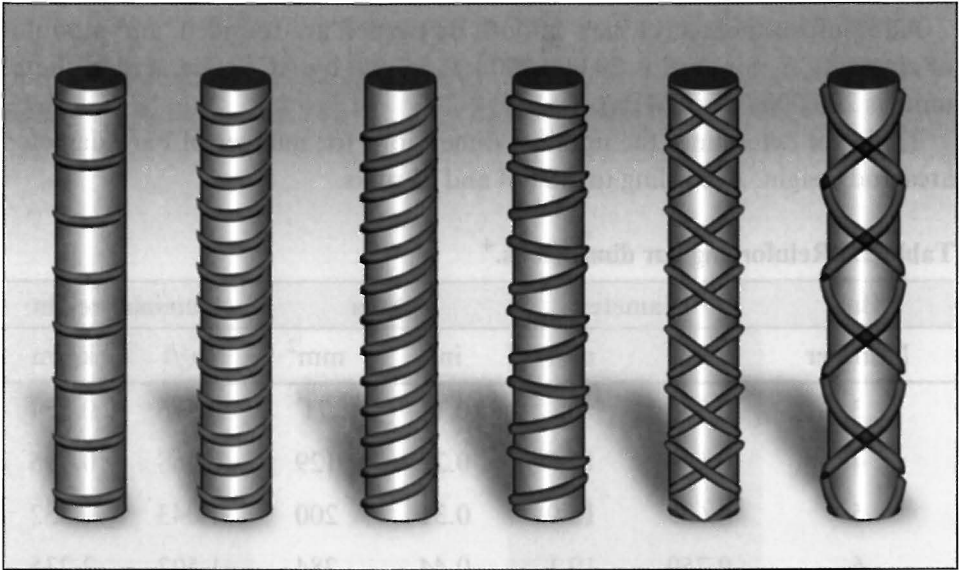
Reinforcing steel bars. (Courtesy of Concrete Reinforcing Steel Inst.)
